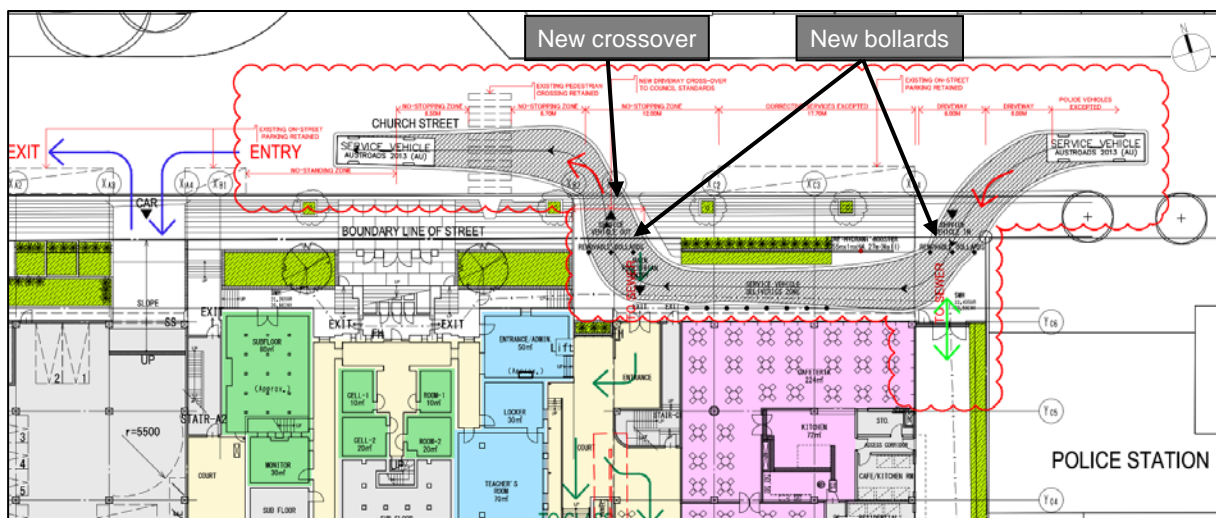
| Service vehicle access arrangement plan (Source: EIS)
